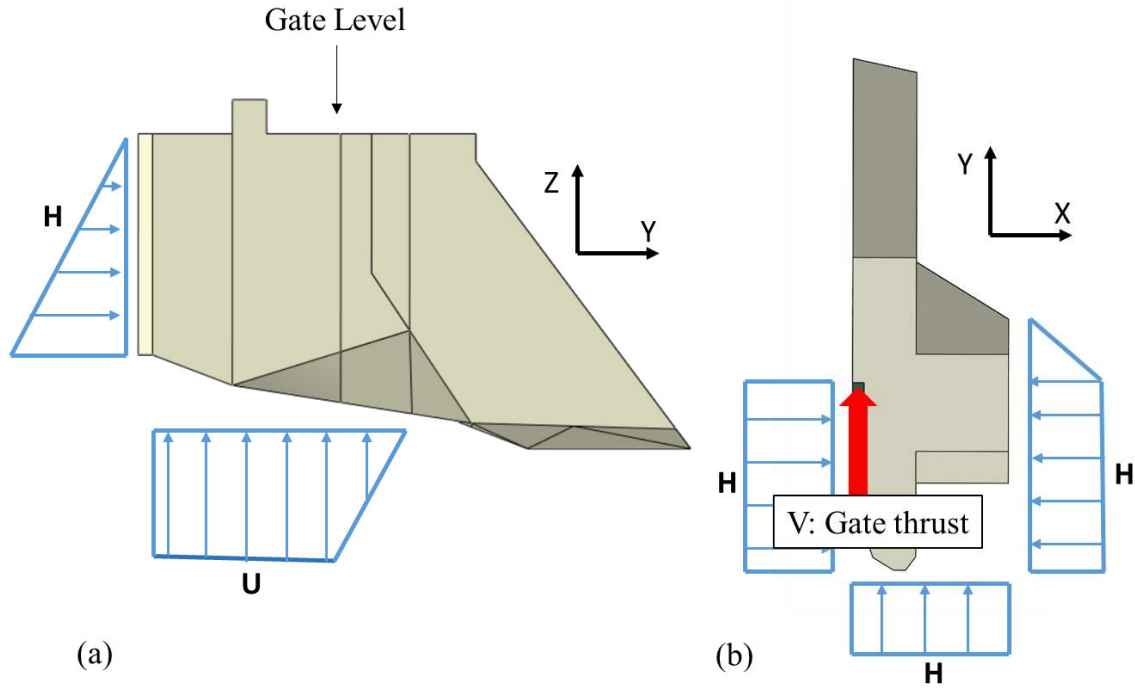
Load conditions on the concrete wedge: H Hydrostatic pressure, U Uplift and V Gate thrust : (a) elevation view; (b) plan view
